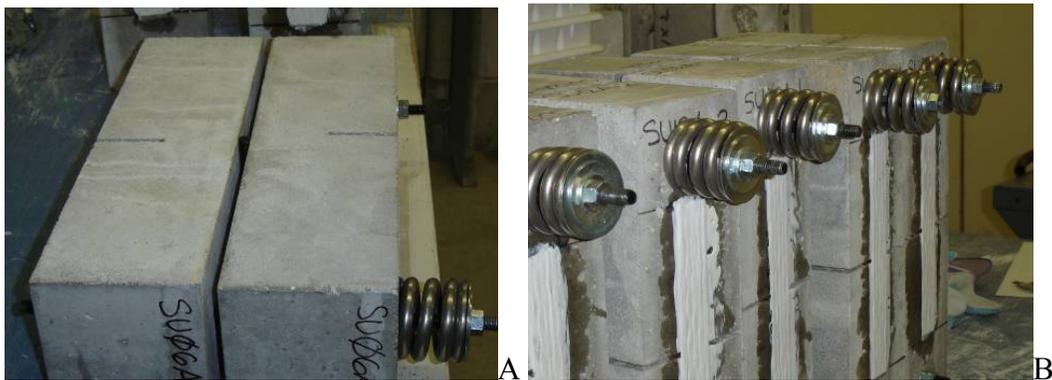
Sustained load exposure set-up. A) Single sustained load frame B) loaded springs in a row of sustained load frames
